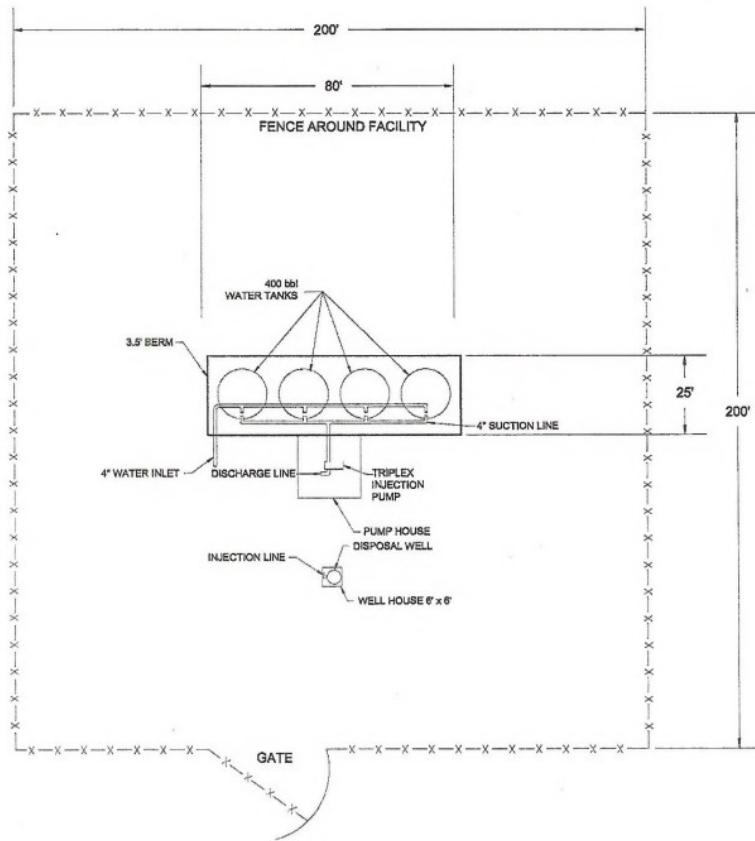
Typical Water Conditioning and Disposal Facility.
